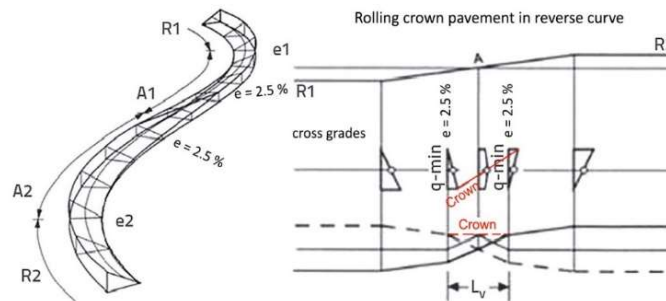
Rolling crown pavement deployed in reverse curve inflection zones on German roads (adopted from TUD. (2013)).
